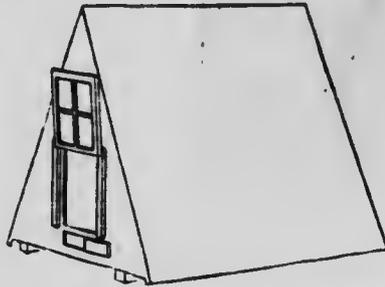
"A" SHAPED BROODER HOUSE AND COLONY COOP.
